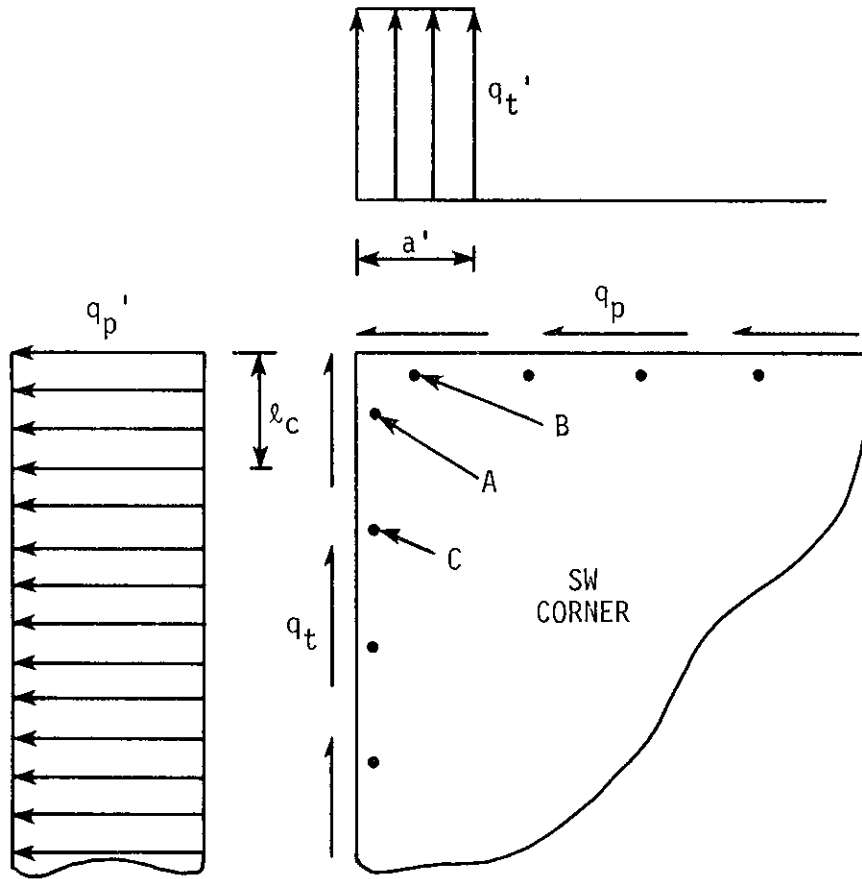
Assumed forces acting on edge connections at corner of diaphragm.
